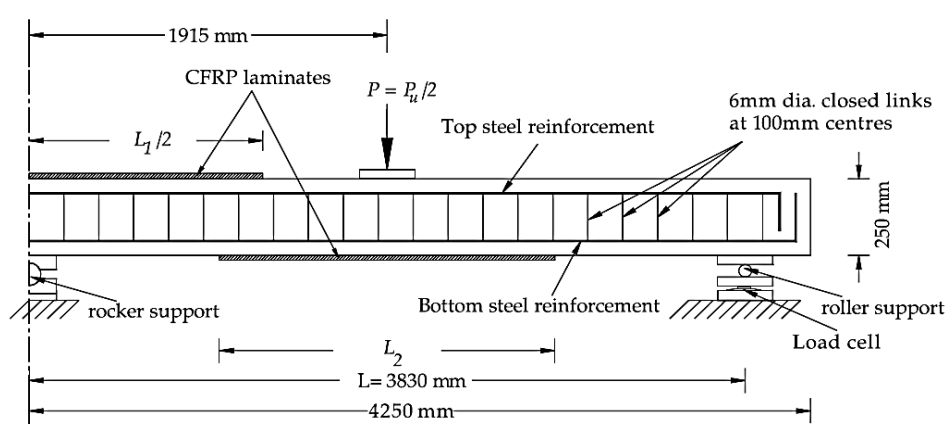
Details of CFRP laminates used in the test specimens (Ashour et al., 2004).
